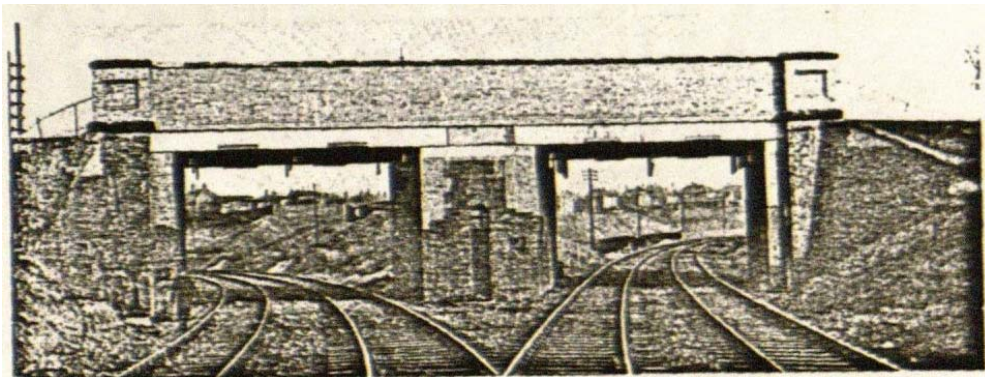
Masonry arch bridge after reconstruction using composite partially prestressed concrete deck for overhead electrification (Bennett 1984)
